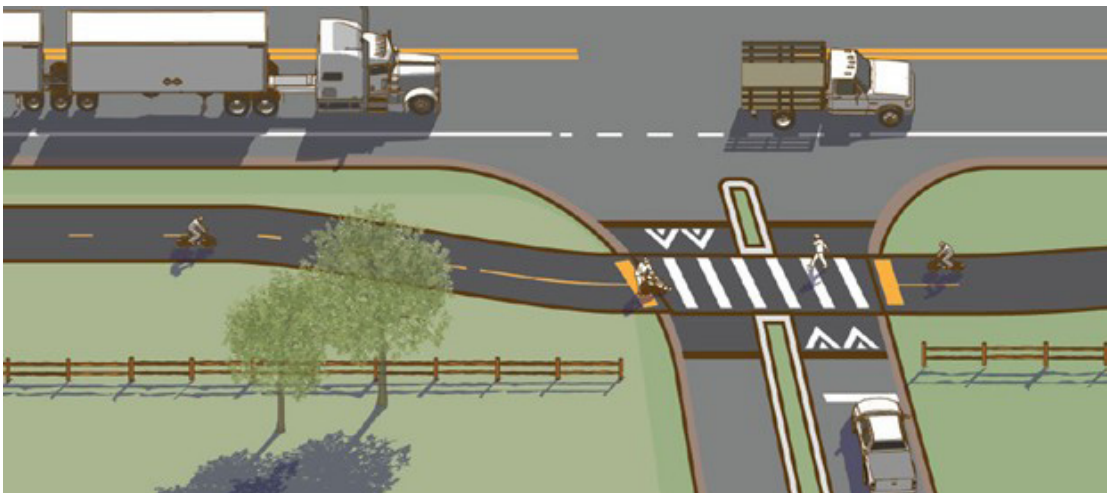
Typical sidepath minor street crossing (Source: FHWA Small Town and Rural Multimodal Networks Guide)
